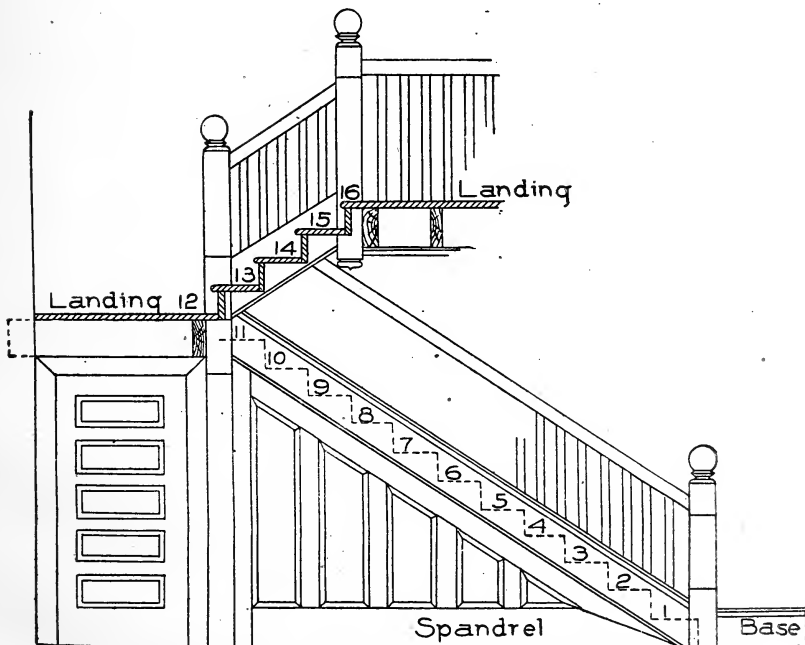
Elevation Showing Construction of Platform Stair of which Plan is Given in Fig. 35.
